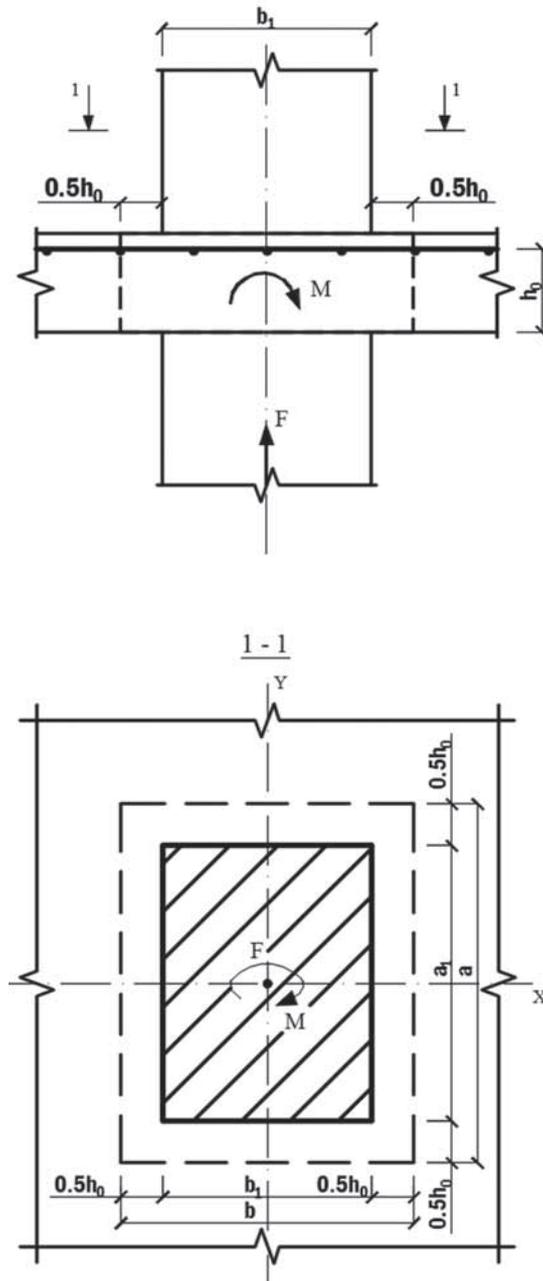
Section and plan of slab and column showing control perimeters for punching shear at an internal column .
